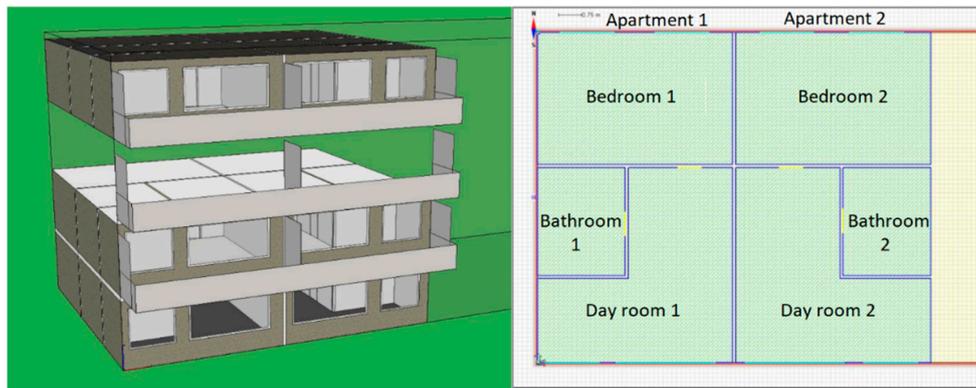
Left: Model from 3D-view IDA ICE and right: floor plan for two apartments, each with three zones.
